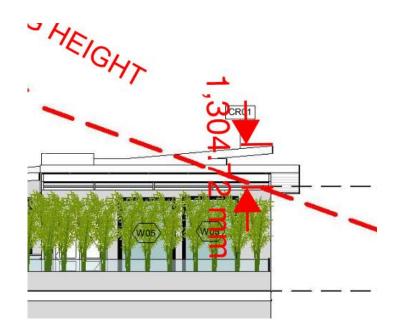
Extract of Architectural plans showing subject building element beyond the 8.5m maximum permissible building height
